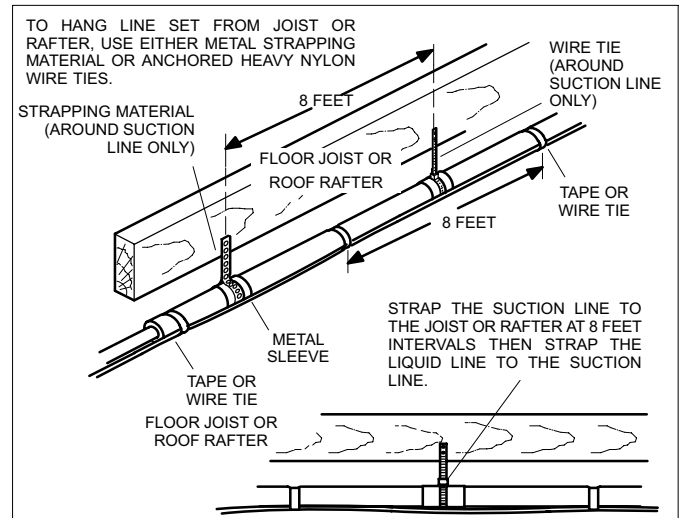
Refrigerant Line Set: Installing Horizontal Runs
